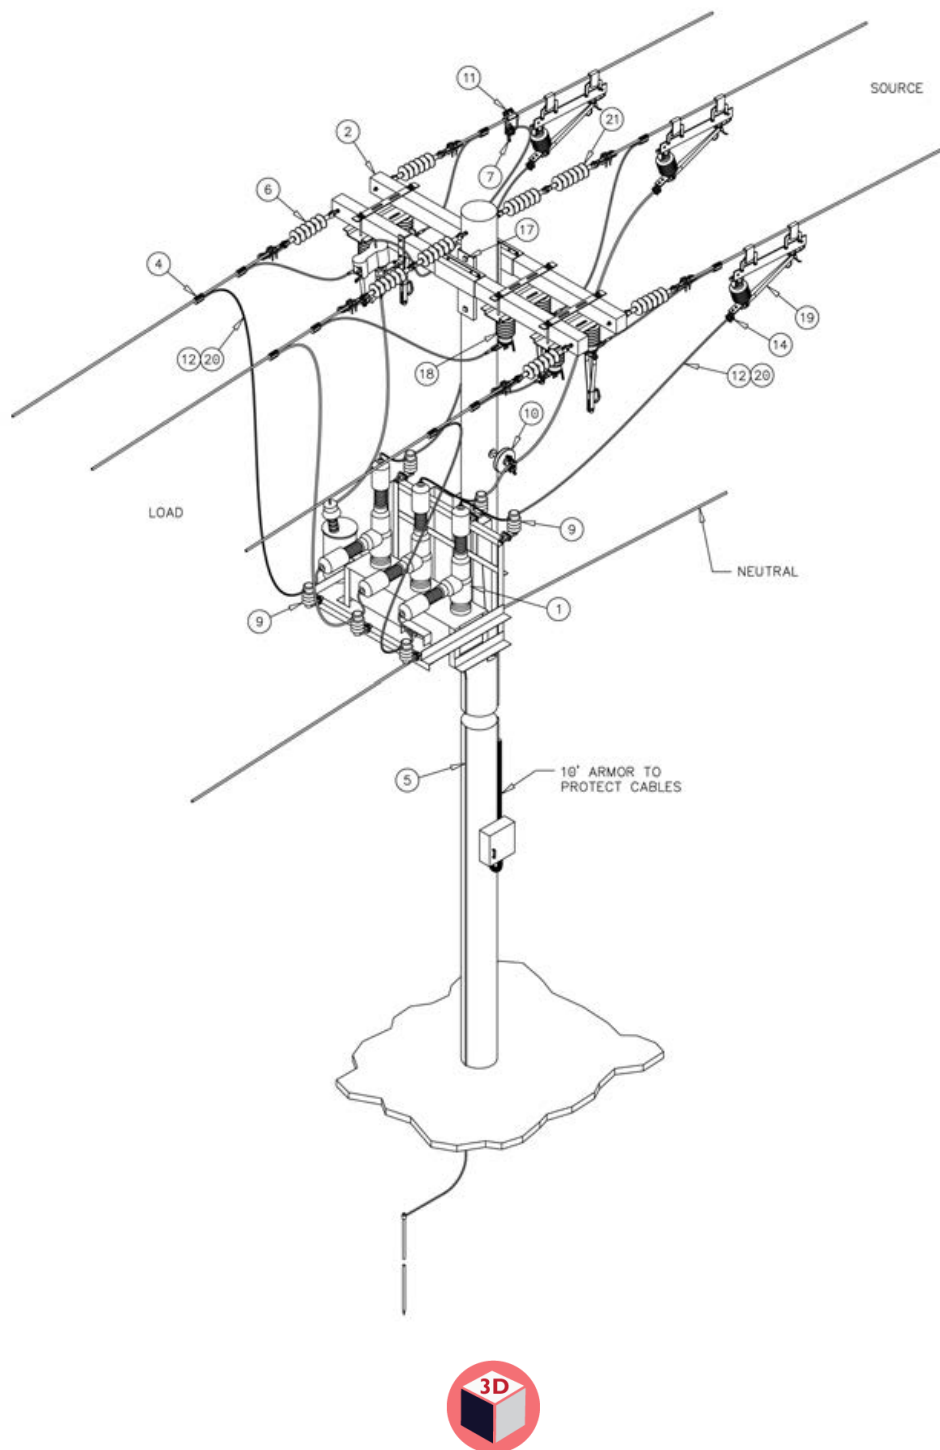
Typical Recloser Assembly, Above 200 A Load, Isometric View
